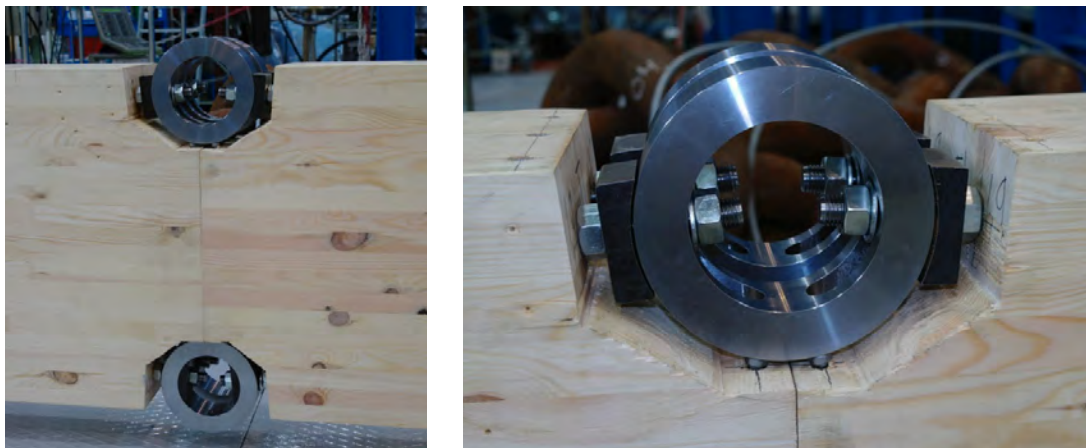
Details of the prototype splice joint with mechanical couplers
